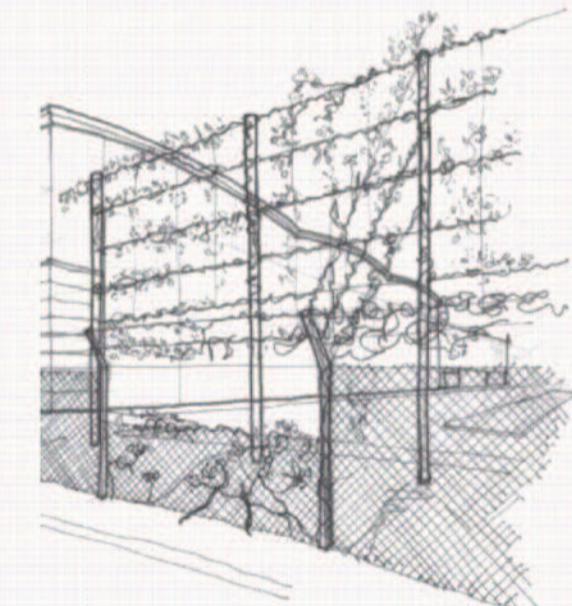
indicative potential green screening that could be incorporated on southern elevation
